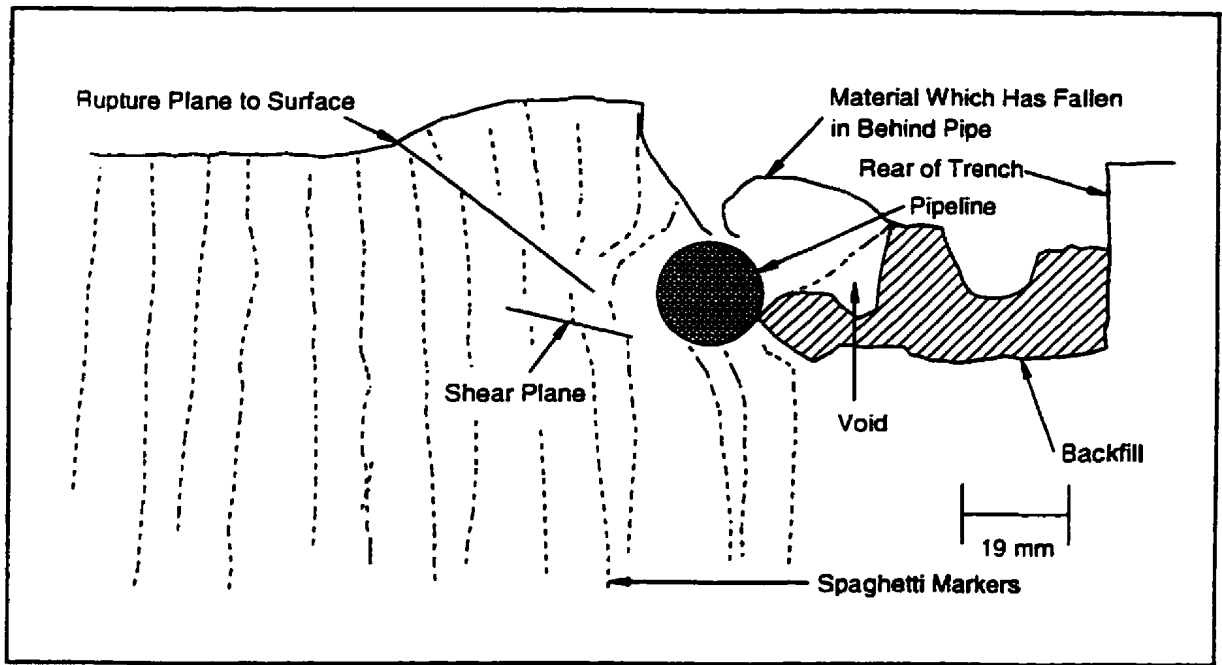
Sketch of excavated cross-section along mid length of model pipeline #1, slurry backfill, Test 09.
